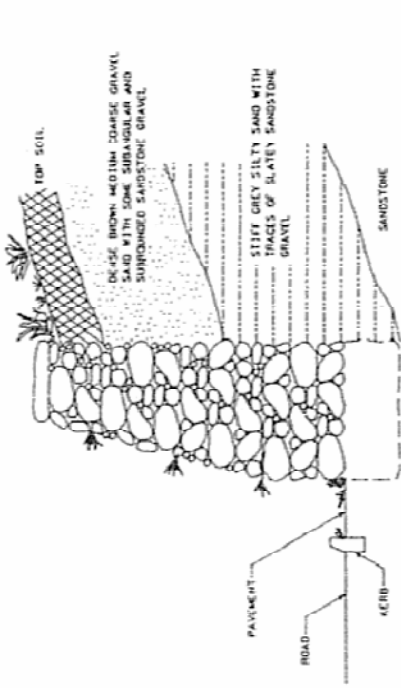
Repair of masonry gravity retaining wall at Bradford, UK.<sup>1</sup>
